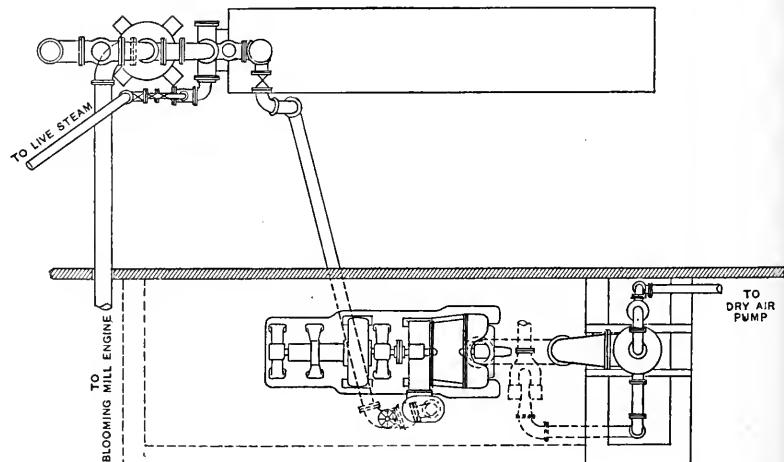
PLAN AND ELEVATION OF LOW-PRESSURE TURBINE INSTALLATION
